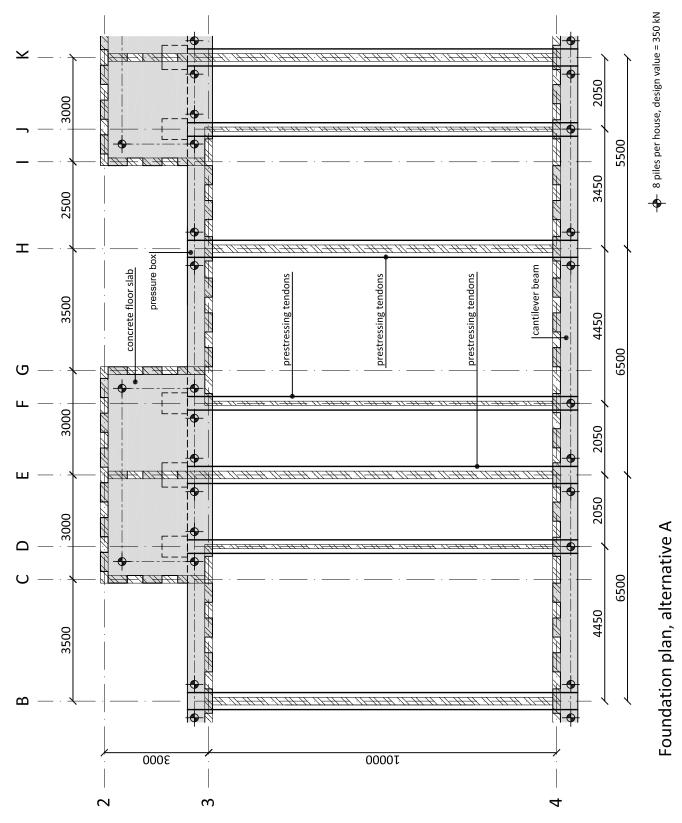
Alternative A, foundation repair plan Marthinus Steynstraat 29-39 (by author).
